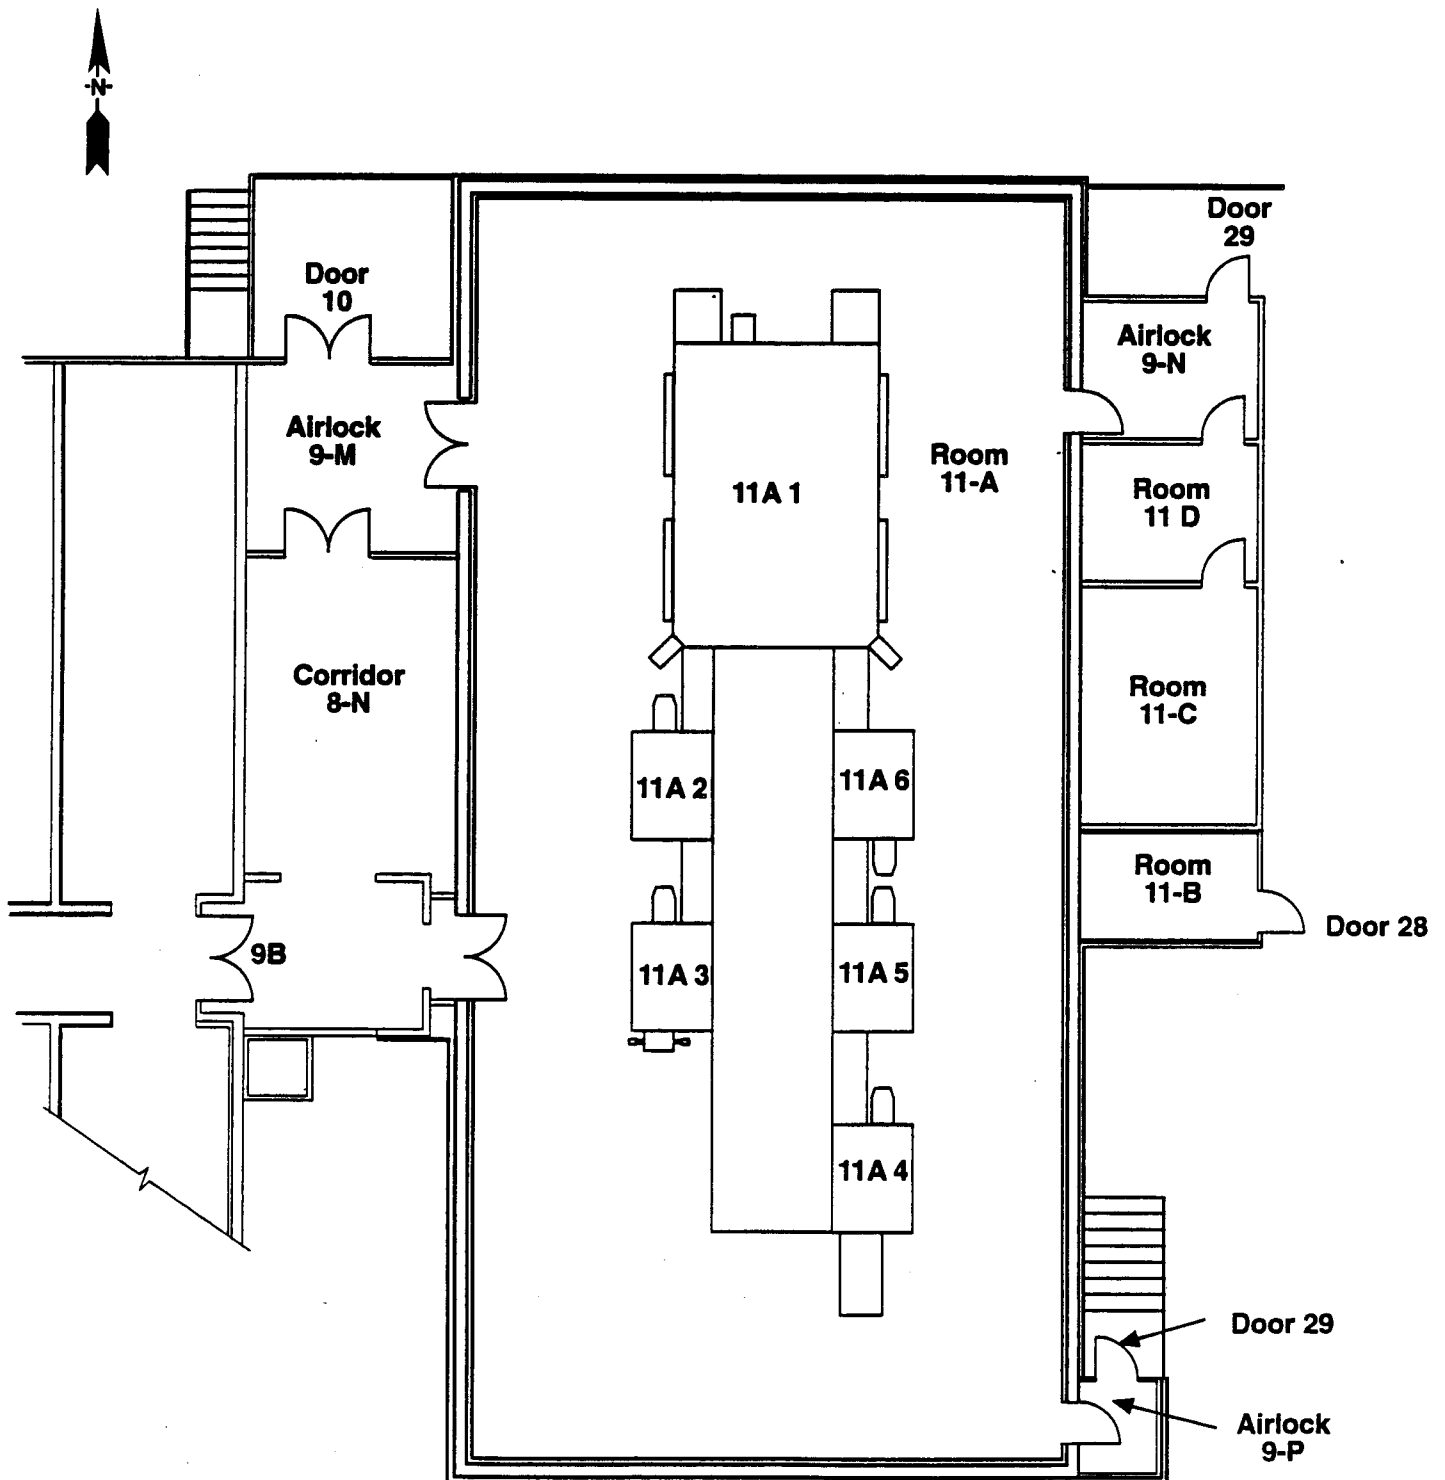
222-S Building Layout. (sheet 2 of 4)
